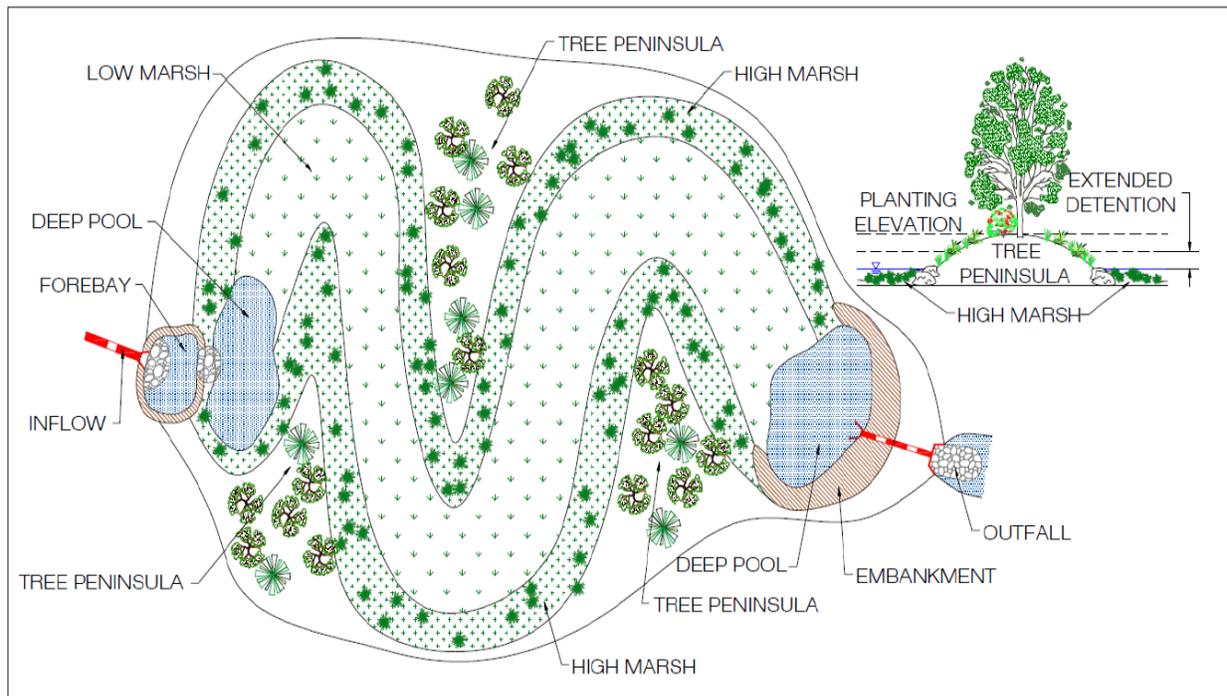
Typical Traditional Constructed Wetland Plan View
